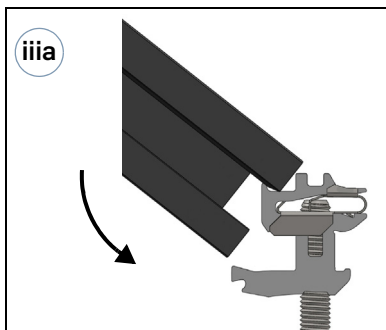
Leveling Foot Installation - Zep Groove and Comp Mount
